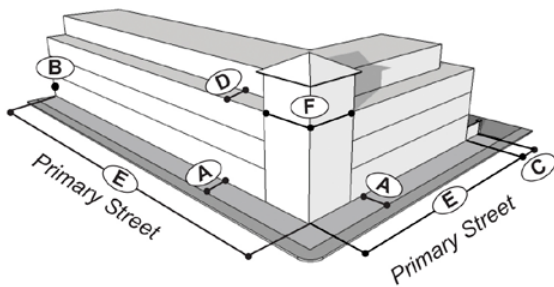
D-4 Building Placement and Configuration and Street Types
